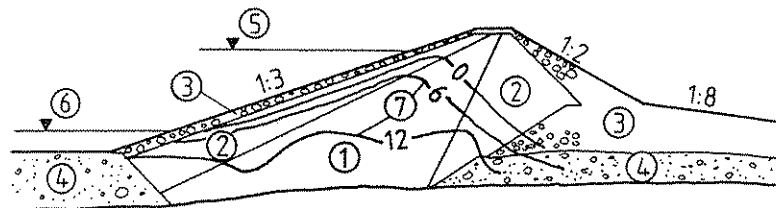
Alcova zoned earthfill dam (adapted from USBR 1973).
